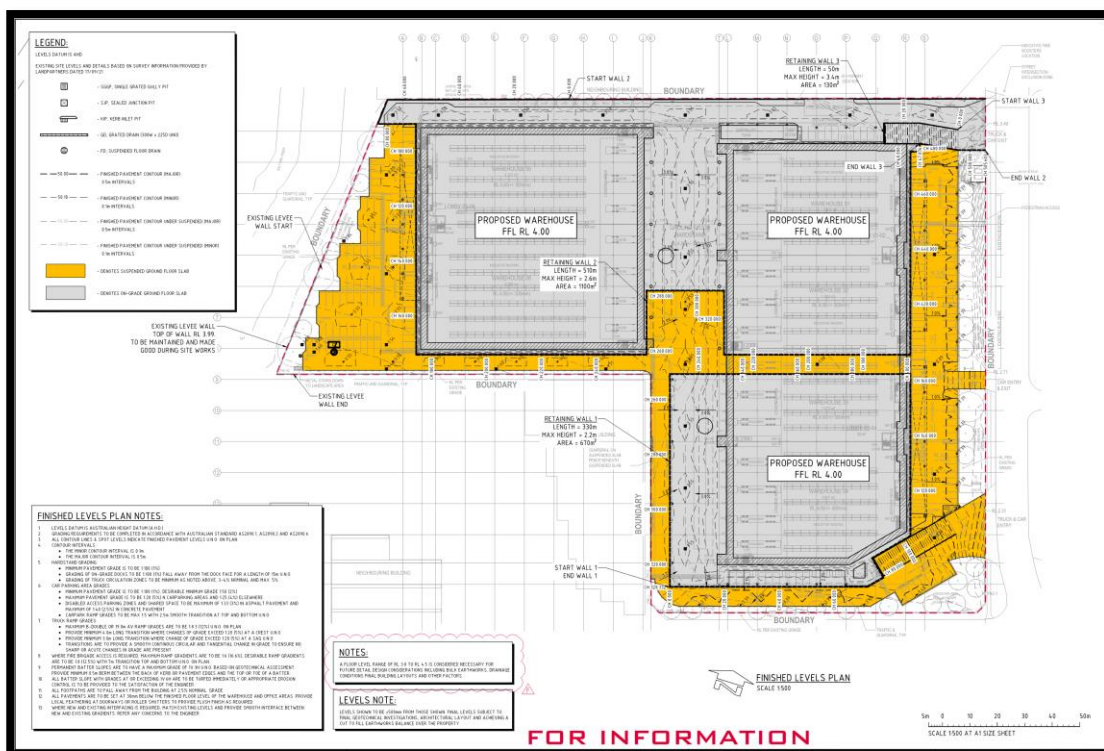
Finished Levels Plan – On-Grade and Suspended
